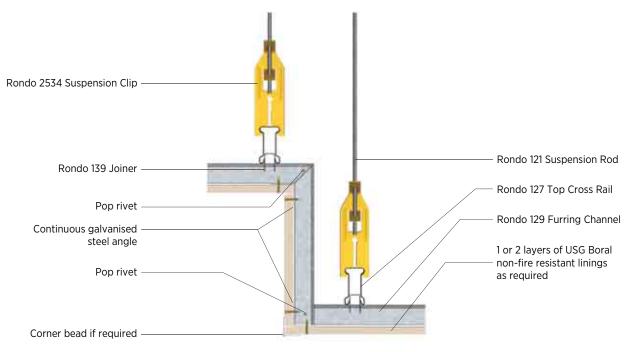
Typical Bulkhead Detail - Section Through Top Cross Rail
